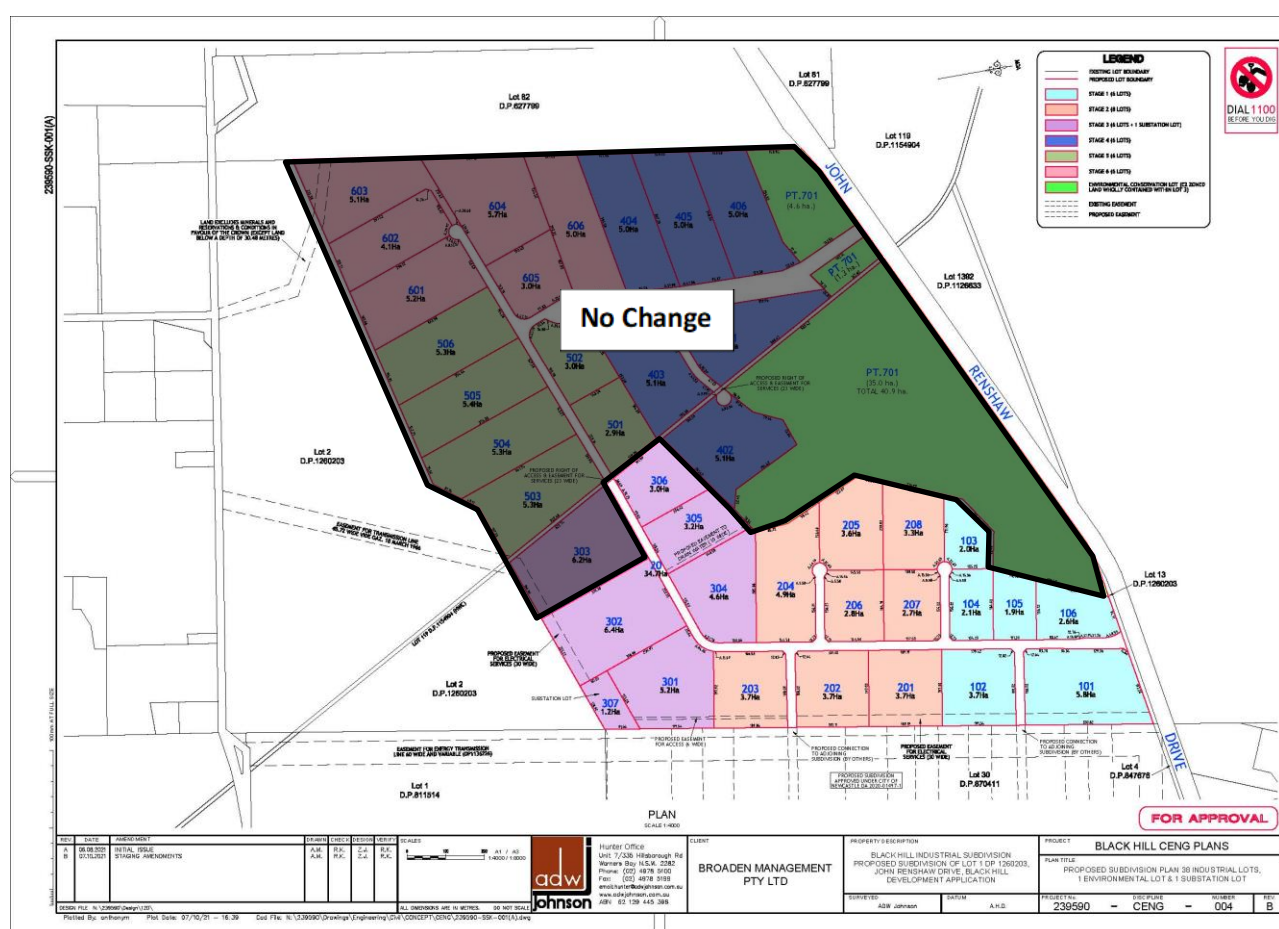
Proposed Subdivision Plan prepared by ADW Johnson dated 07/10/2021
